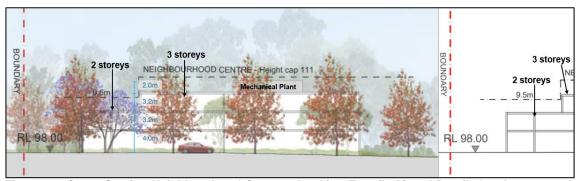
Cross Section Neighbourhood Centre – Looking East (Left) and Detail showing stepped built form to boundary (right).
